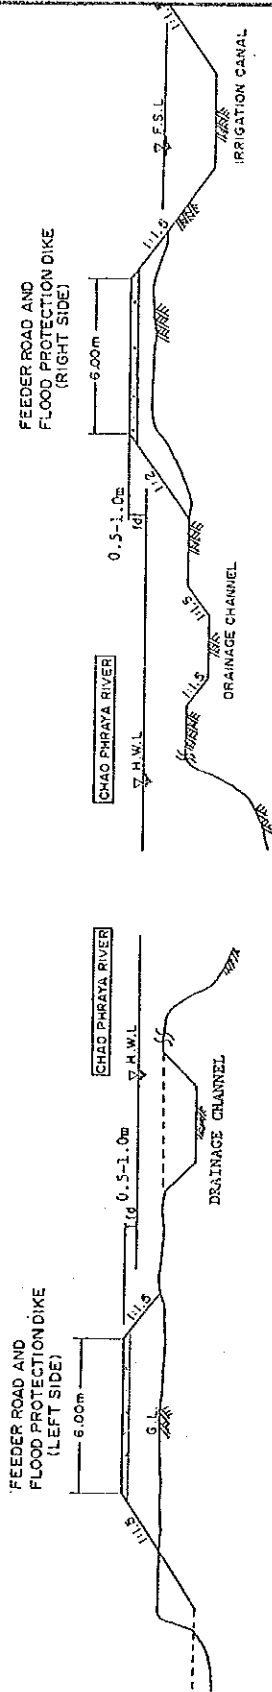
(1/2). TYPICAL CROSS SECTION OF FLOOD PROTECTION DIKE
